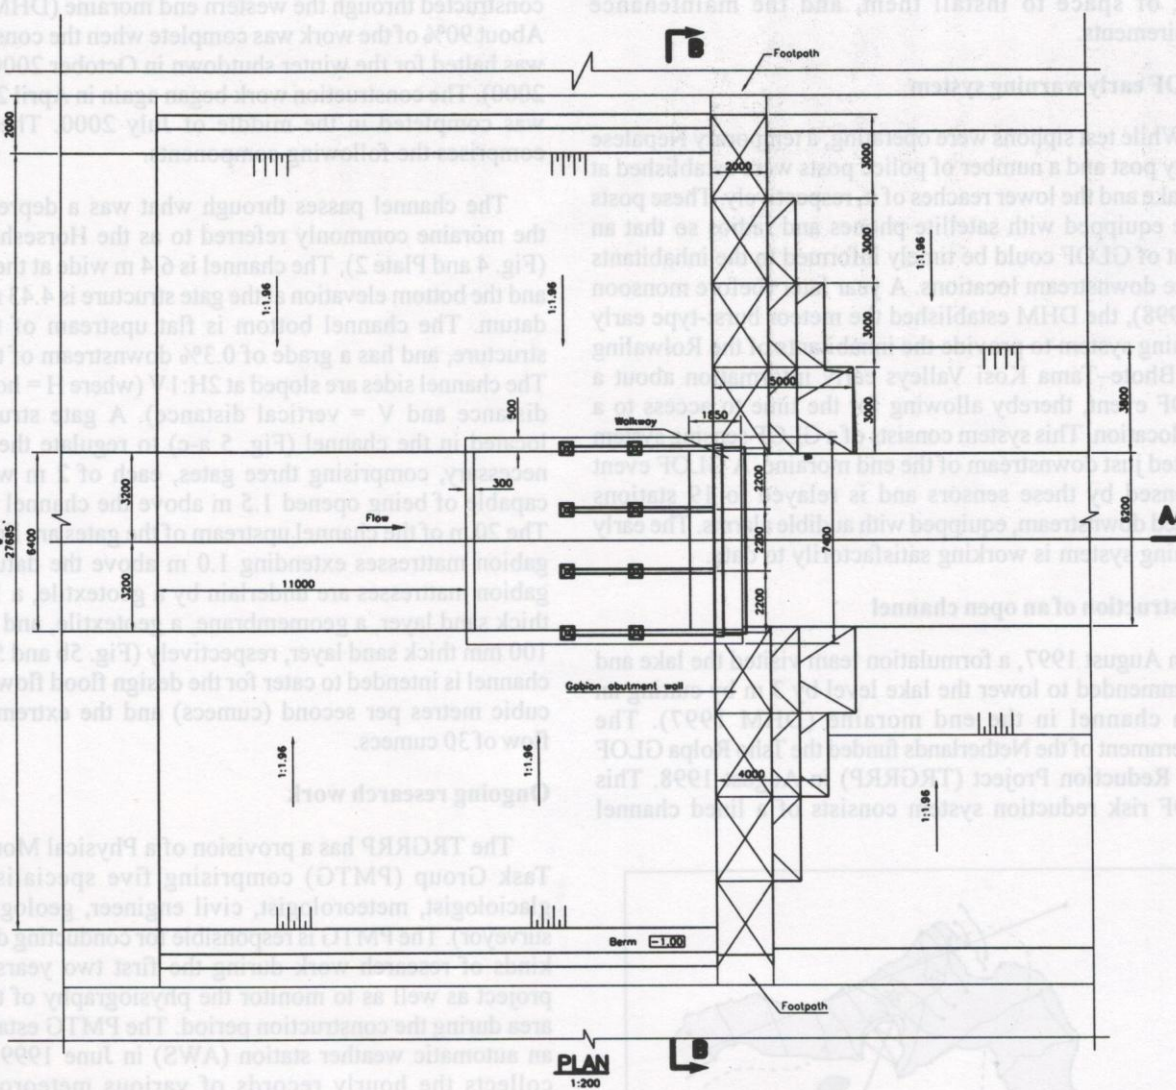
Drawings of the engineering structures constructed at the Tsho Rolpa Lake: a. plan,
